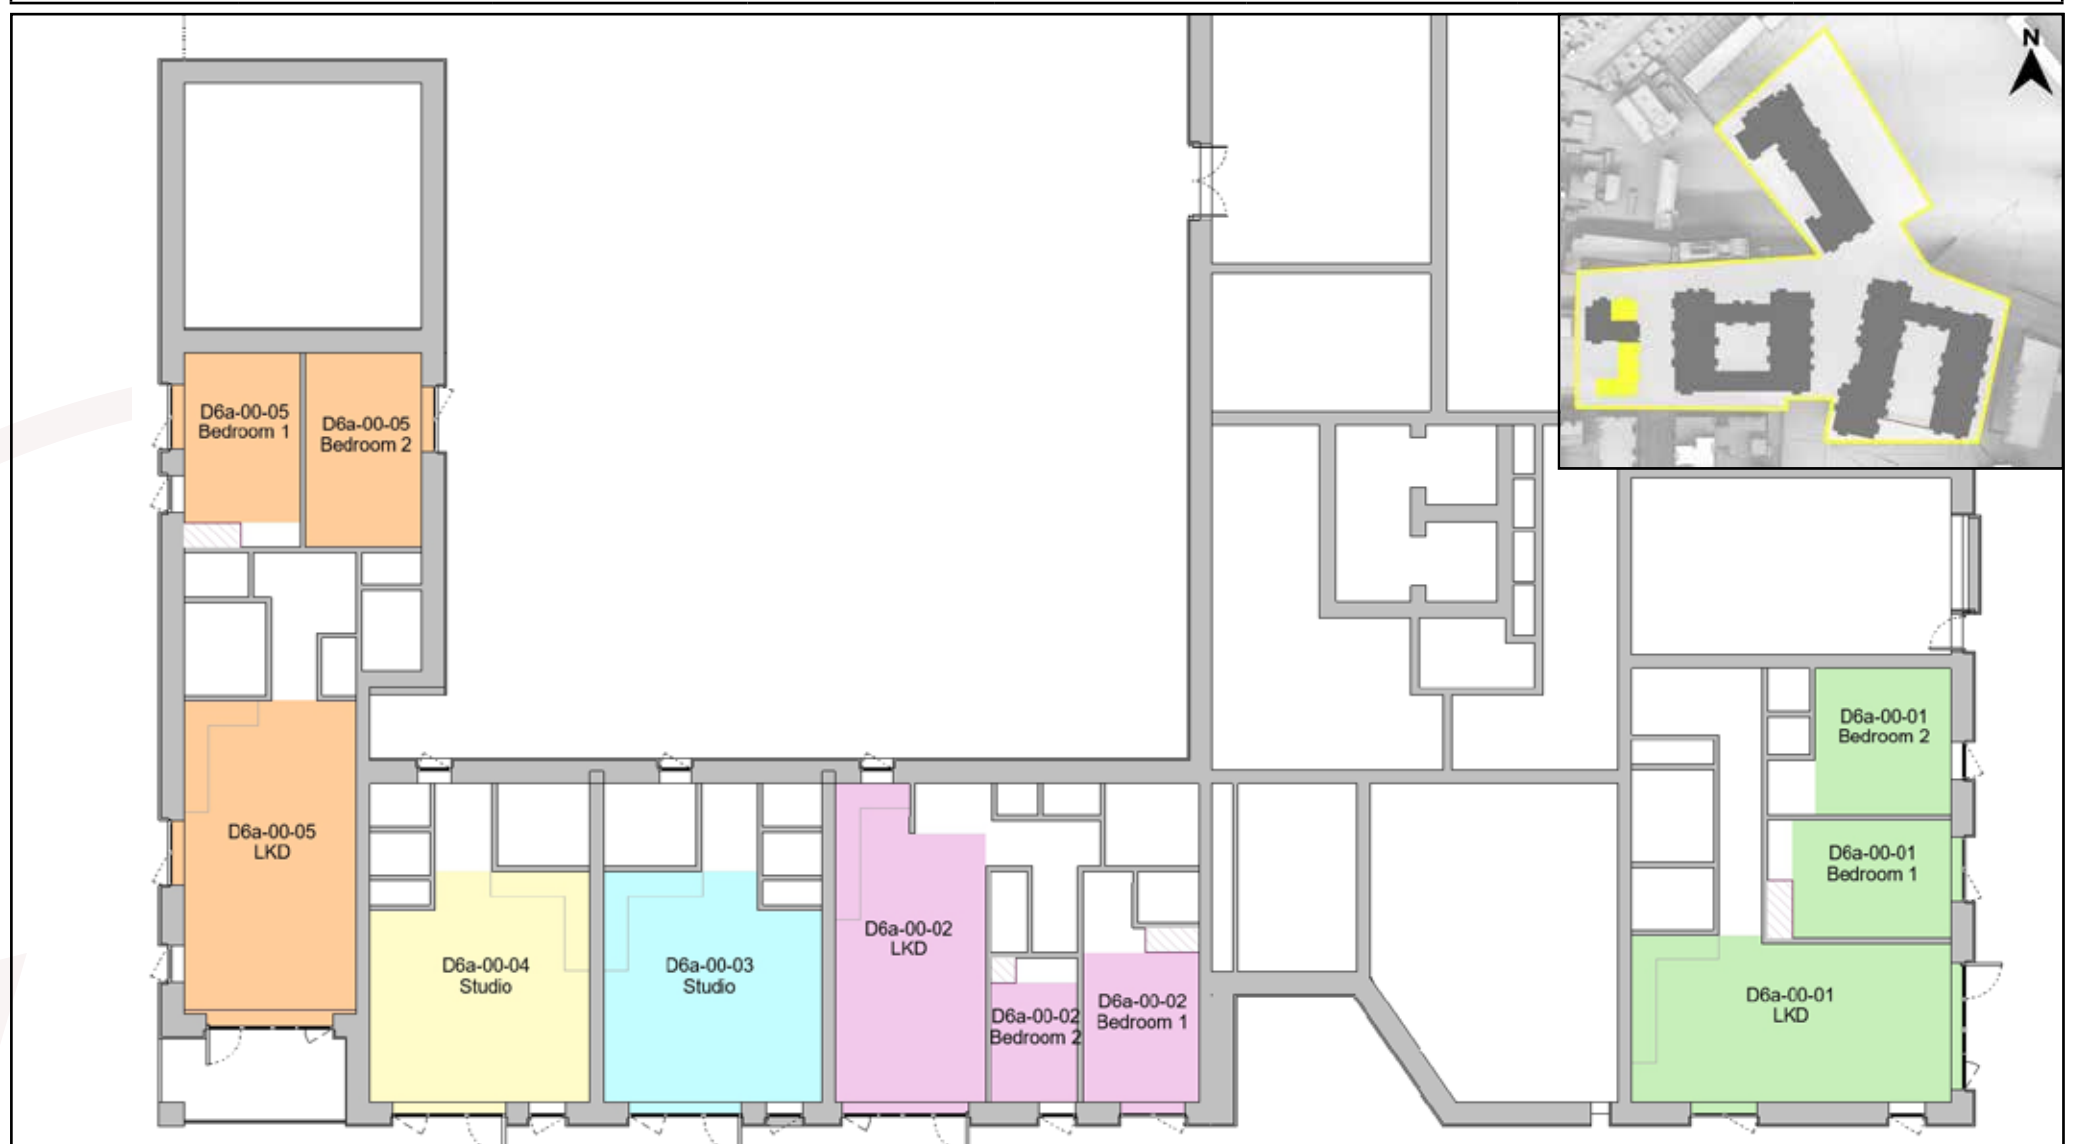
Floor plan of assessed building (L), Keyplan highlighting the assessed building (R).
